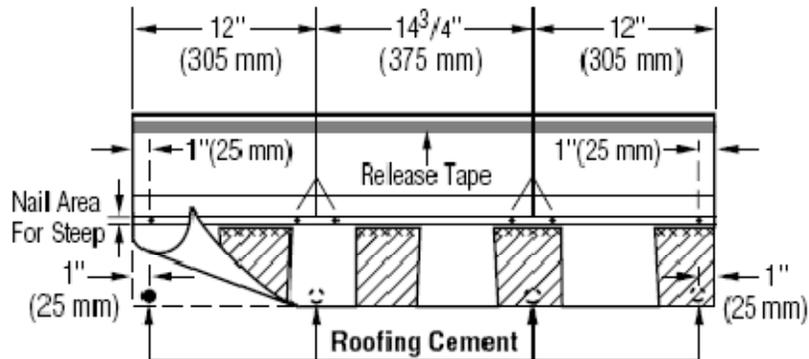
Use six nails and four spots of asphalt roofing cement on steep slopes.
